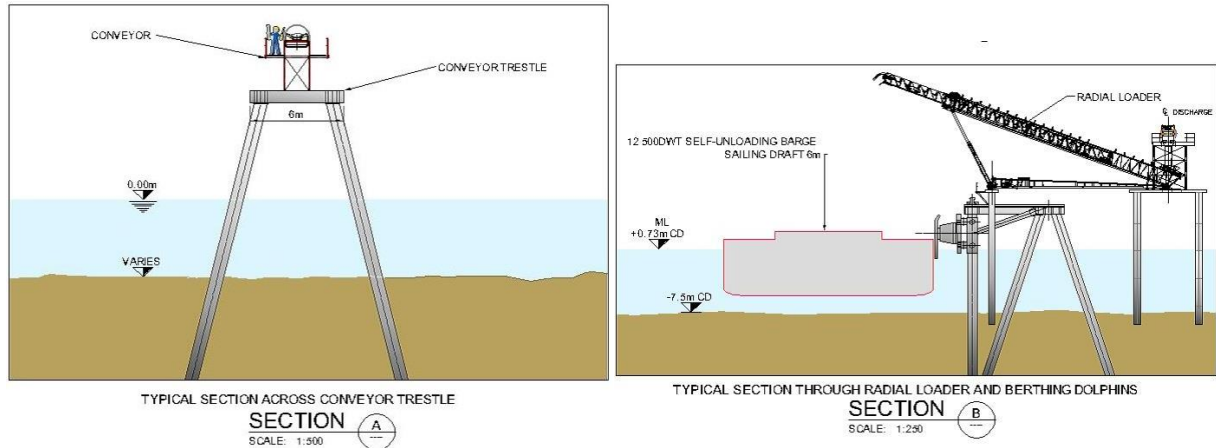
| Cross section of an ‘A’ frame wharf and ship loading equipment
